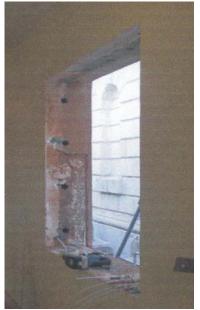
Typical retrofit project in brick masonry drilled and ready for blast proof window installation
